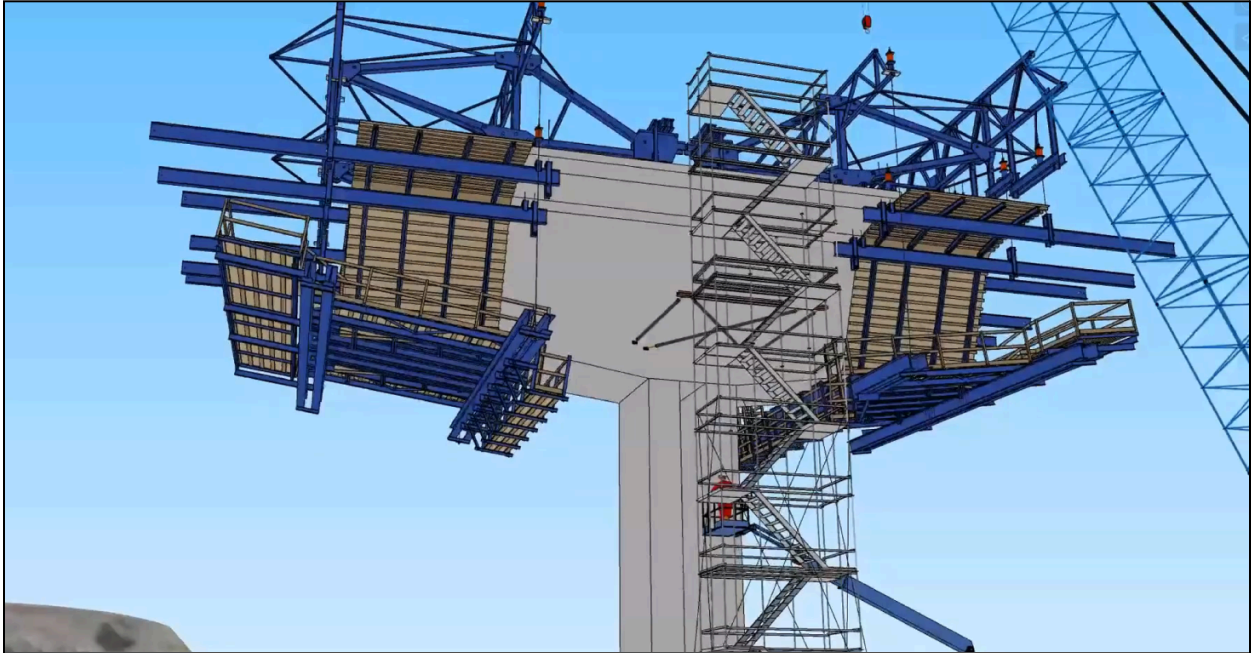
Pier Table Top Slab Construction: Trinity River Bridge, TX
